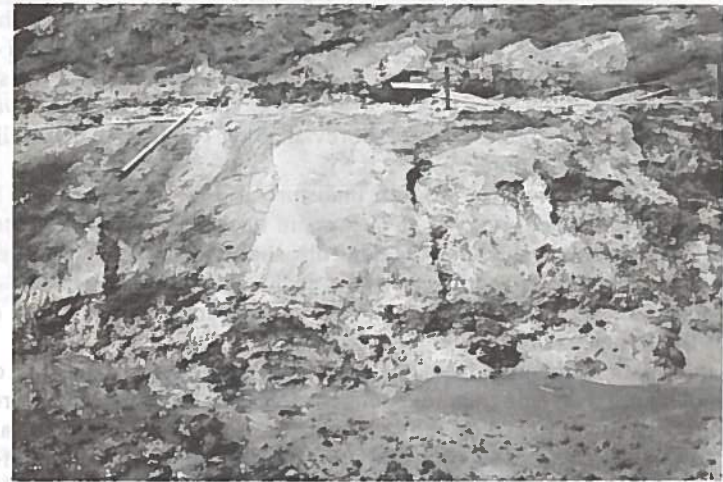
Enlarged Views at Bottom of Test Trench in Fig. 14
